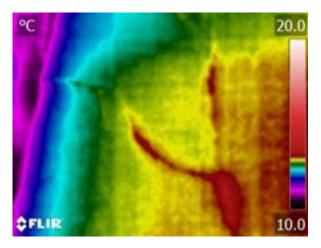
IR image showing heat transmission through diagonal cracks in wall
